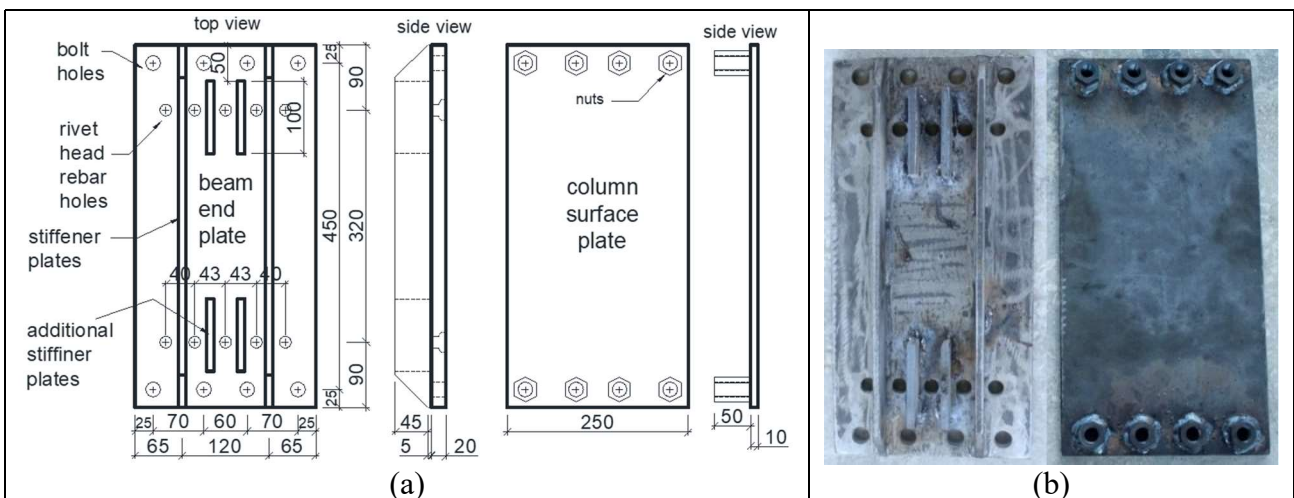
Details of connection plates used for CB2-Pre-1 and CB2-Pre-2 specimens; (a) Geometry of beam end-plate and column surface plate; (b) General views of the beam end-plate and column surface plate
